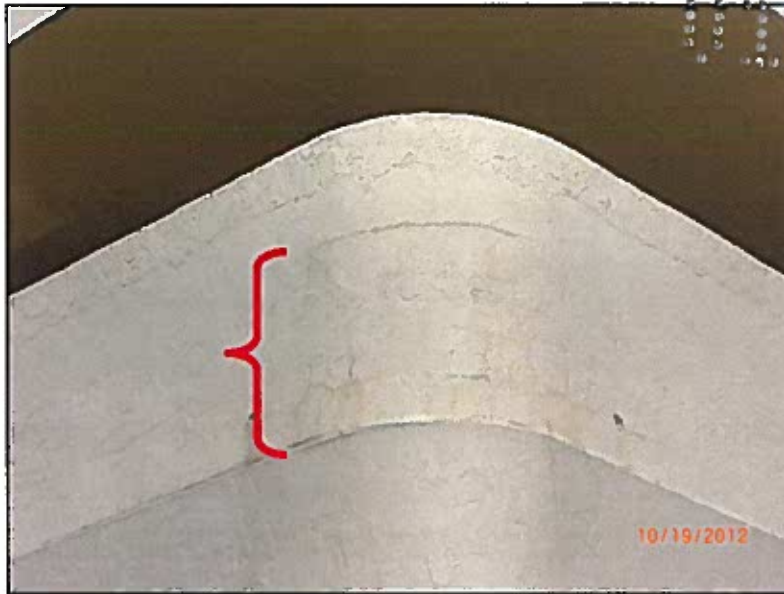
spider web cracking on exterior face at second floor balcony on East side
